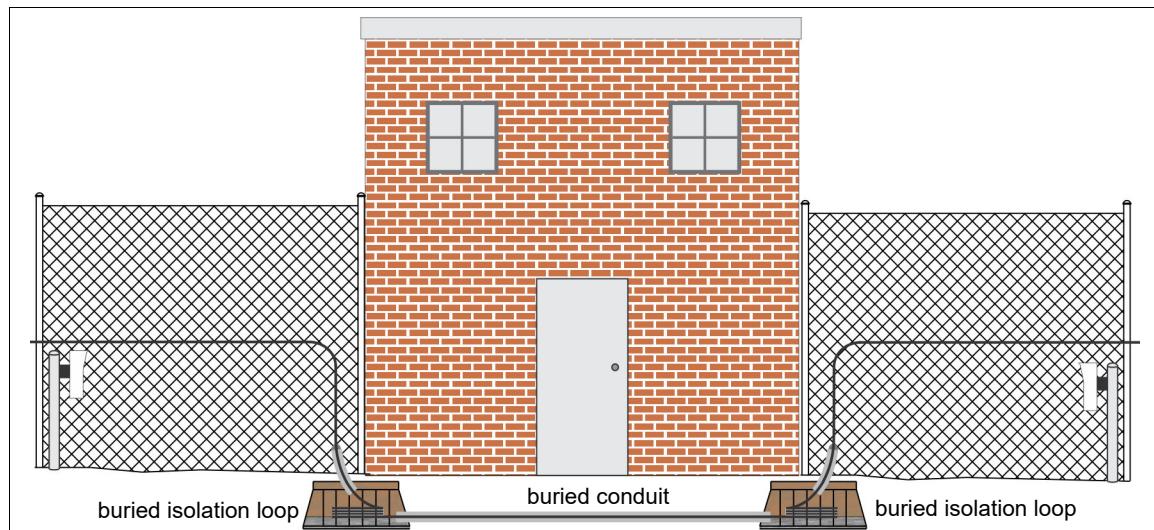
Perimeter structure bypass (below ground with buried vaults)
